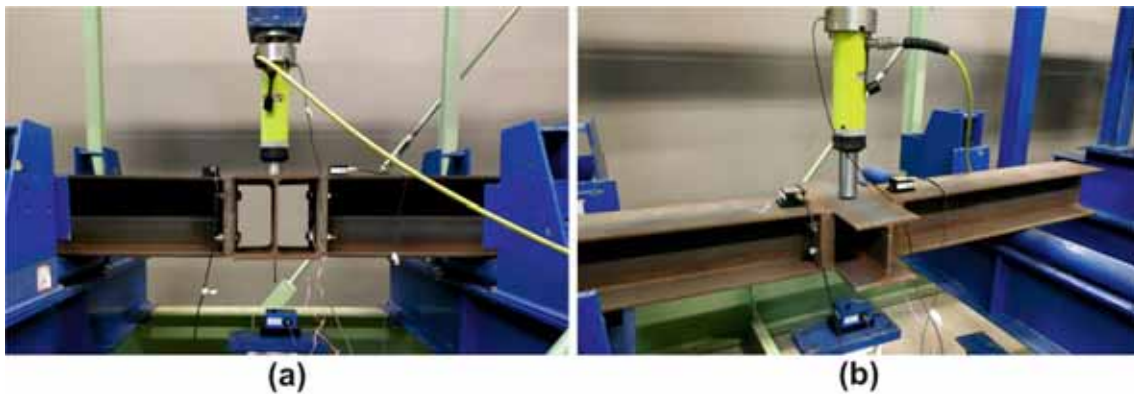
(a) Frontal view of the Test B01 and (b) top view of the Test B05.
